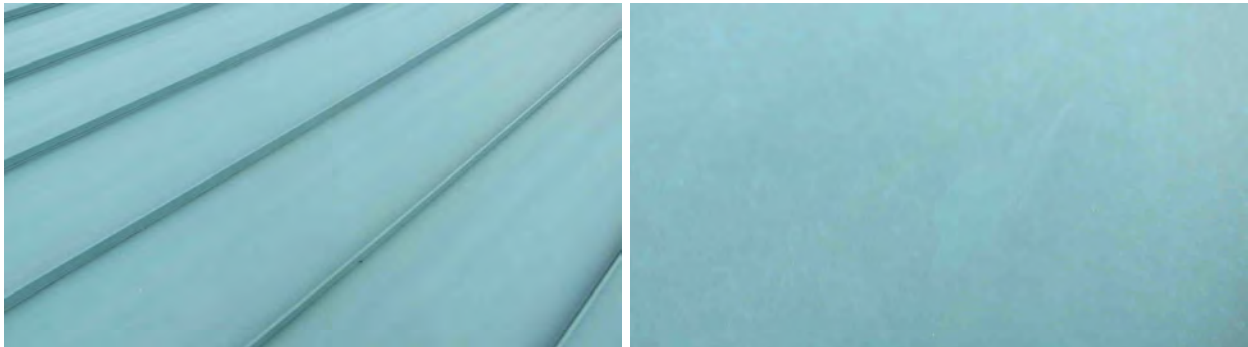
Roofing on the Bob Burns hall (1) with no hail damage.
